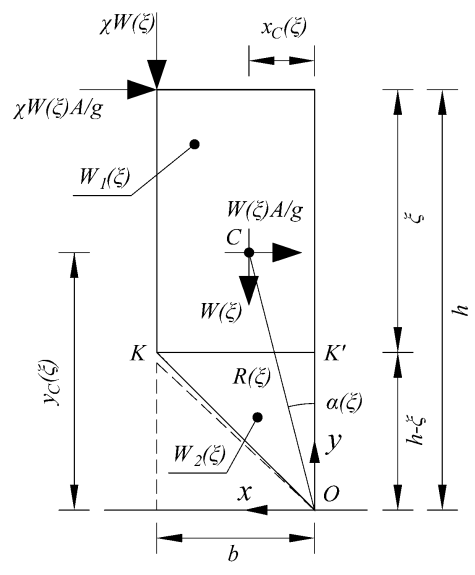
Forces acting during the rocking of the cracked wall pier.
